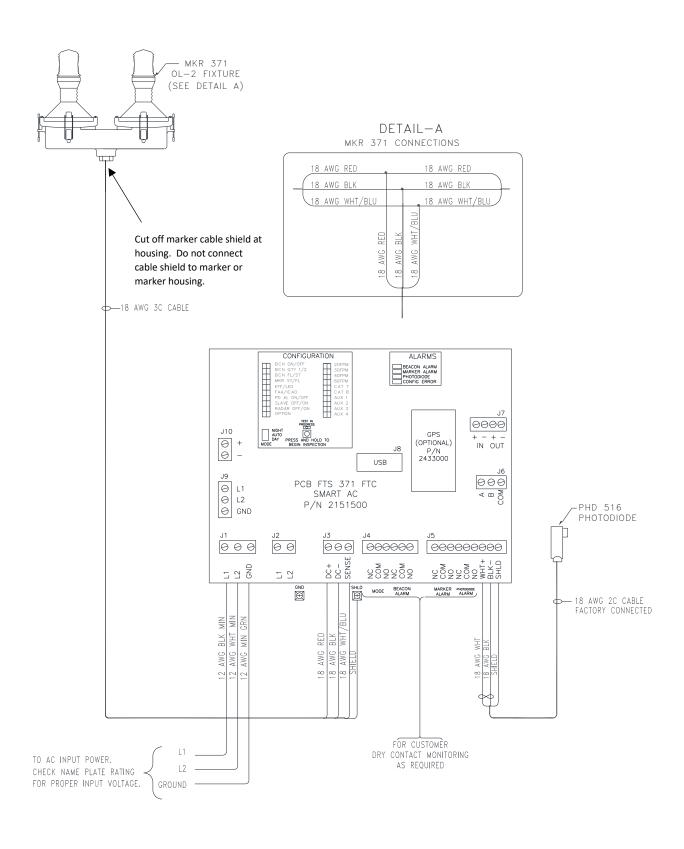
FTS 371 SMART AC Typical FAA Type A0 Installation Wiring
